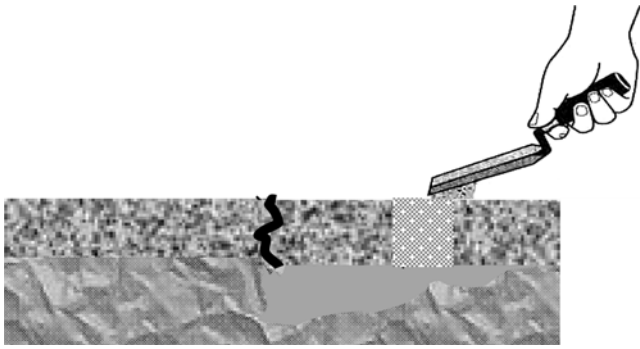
Filling of holes used for grout pumping after completion of slabjacking.
